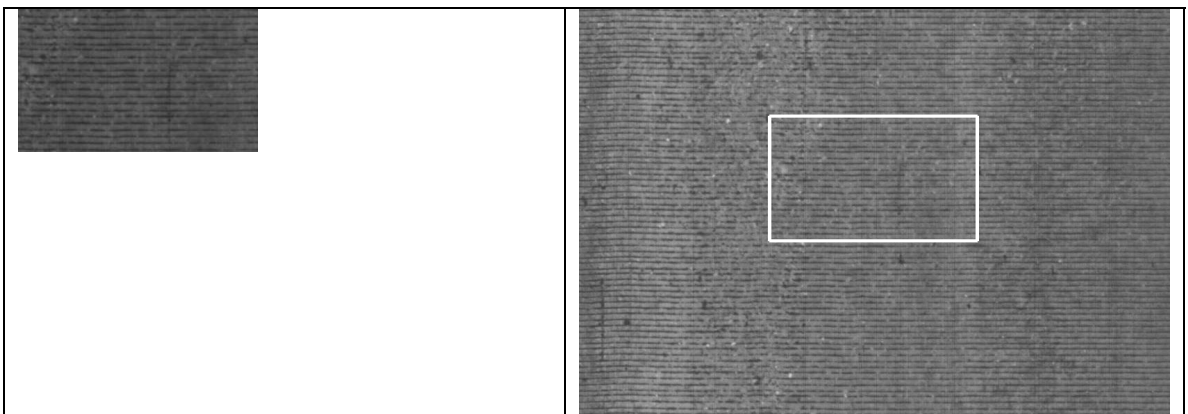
(a) Query Image of a Cracked Concrete Pavement
